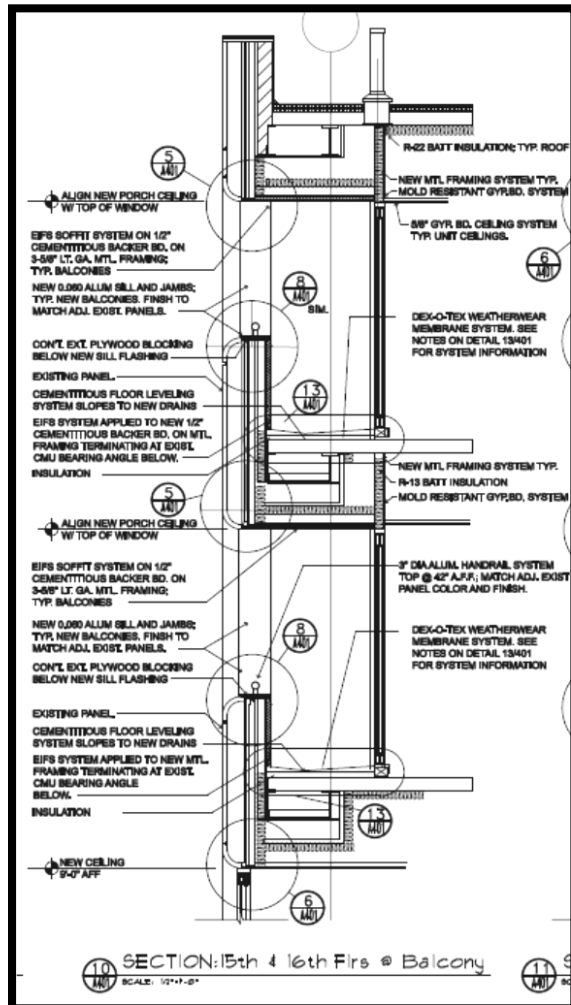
Section View of Inboard Balconies on the 15th and 16th Floors
